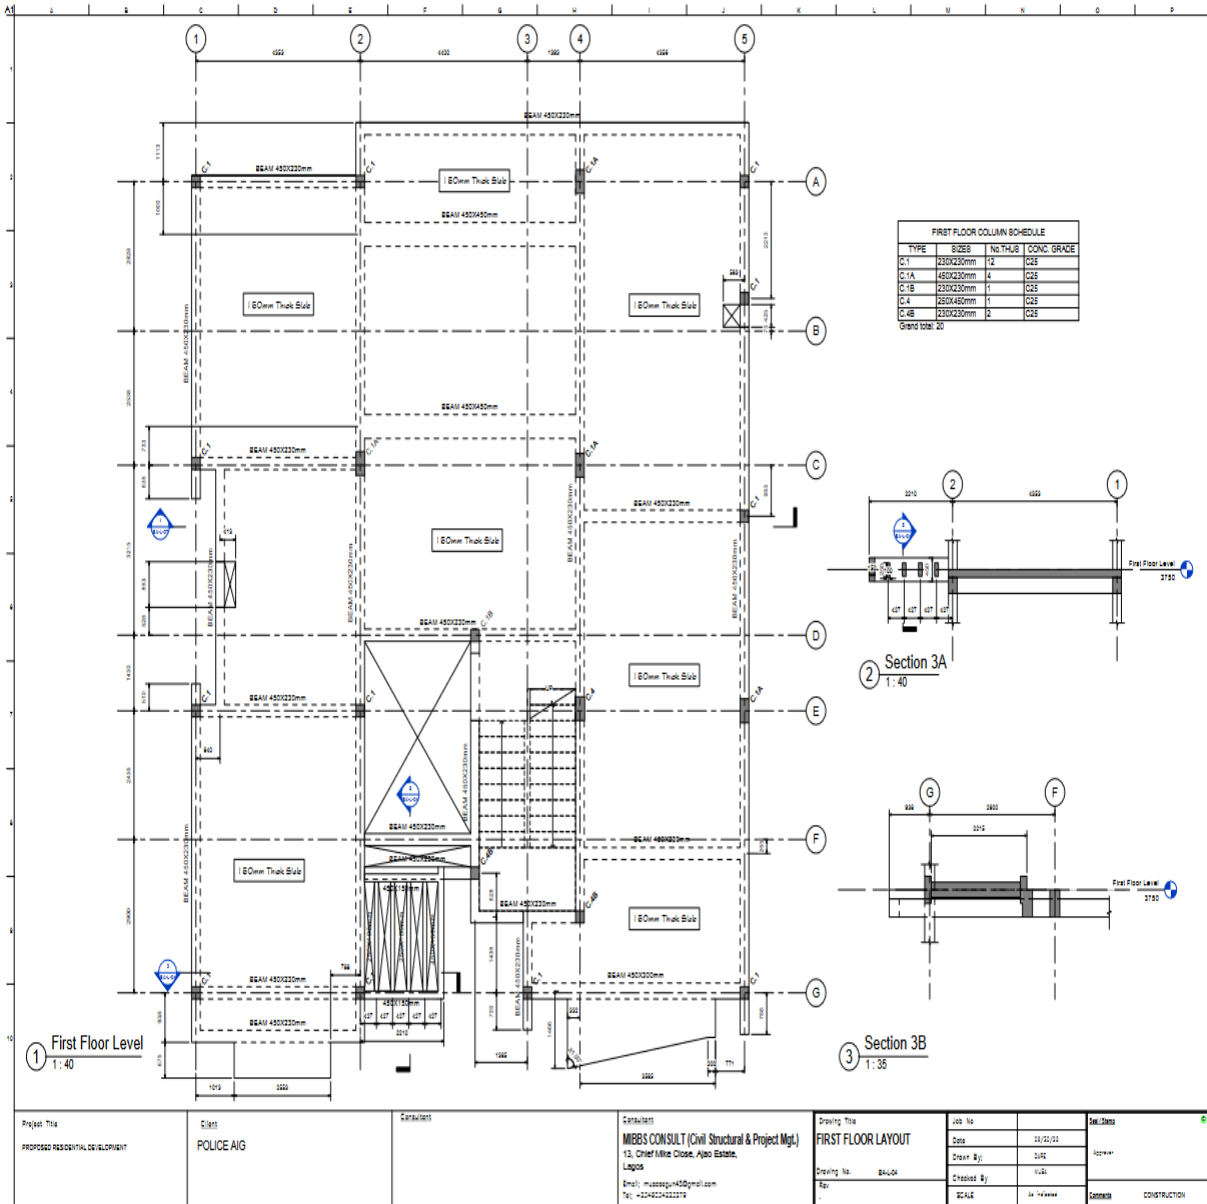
STRUCTURAL FIRST FLOOR OF THE INVESTIGATED BUILDING
